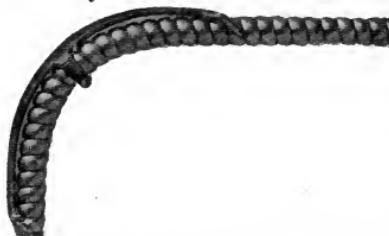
Use of Elbow Clamp for Fastening Flexible Conduit in Place.
